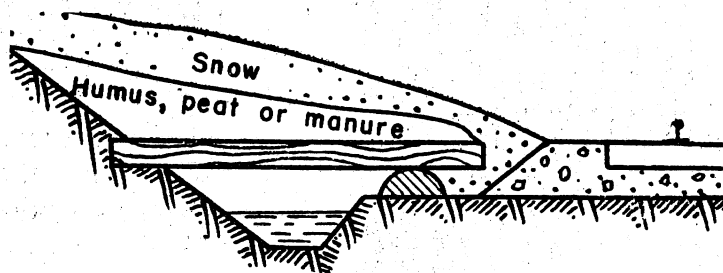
Diagram Showing Insulation of a Ditch for Drainage in Winter
